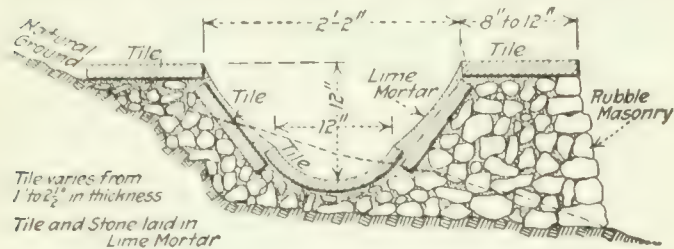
Typical Cross-section of Old Mission Conduit Near San Diego, California.
